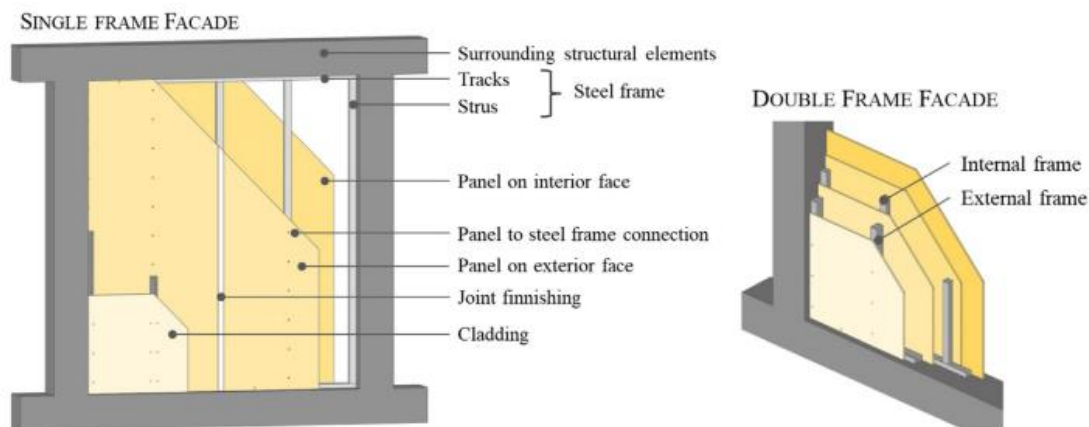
3D illustration of the constructional details of lightweight steel drywall façades
